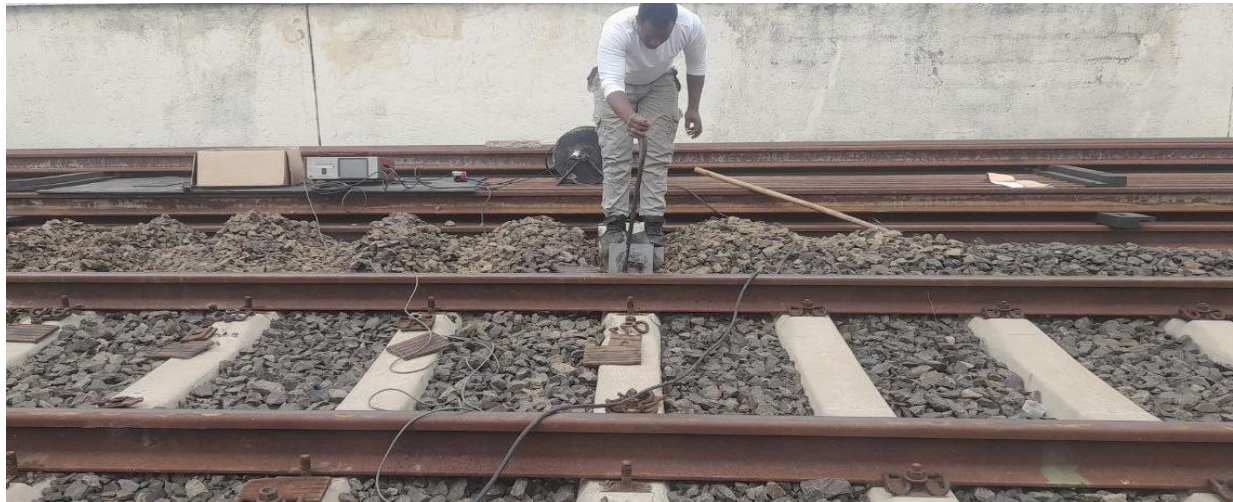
Installation of the test instrument and conduct of the test at full section
